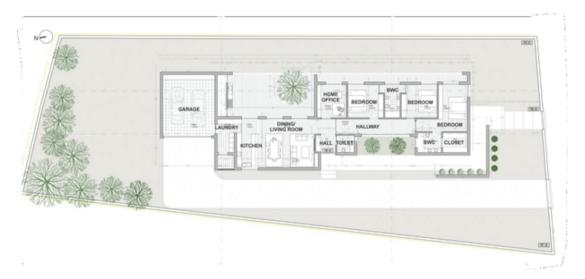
Light Steel Frame residence – floor plan Source: Architect file
